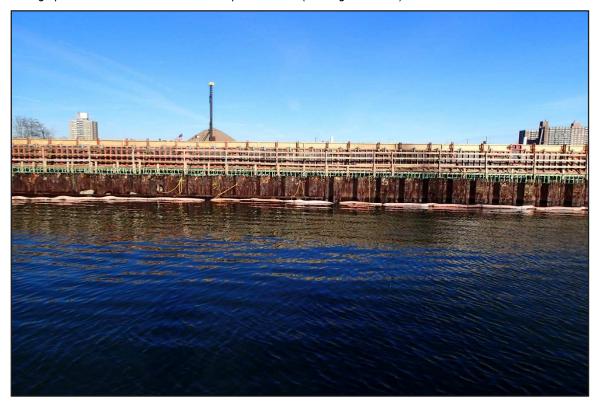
Overview of the West Bulkhead (Looking southeast)
